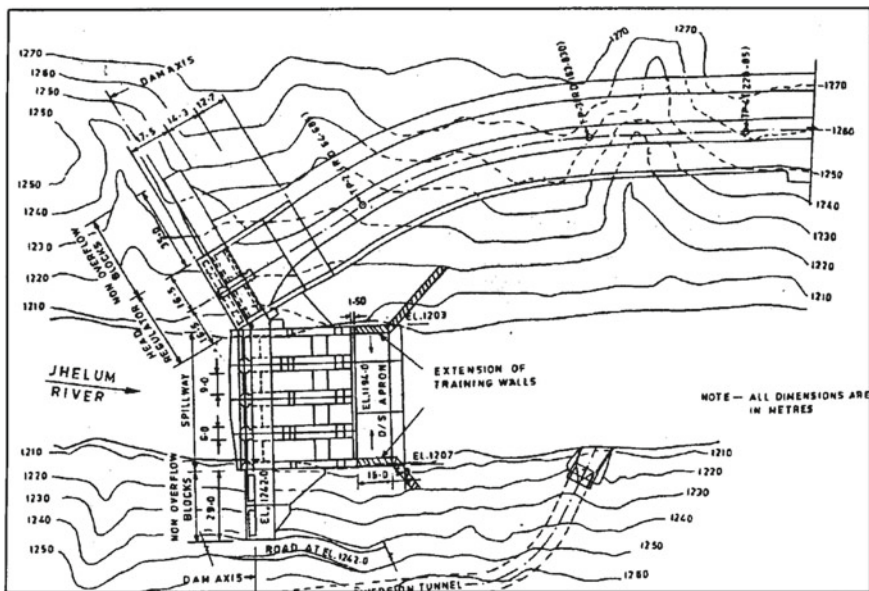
Extension of training wall downstream of spillway to prevent bank erosion
